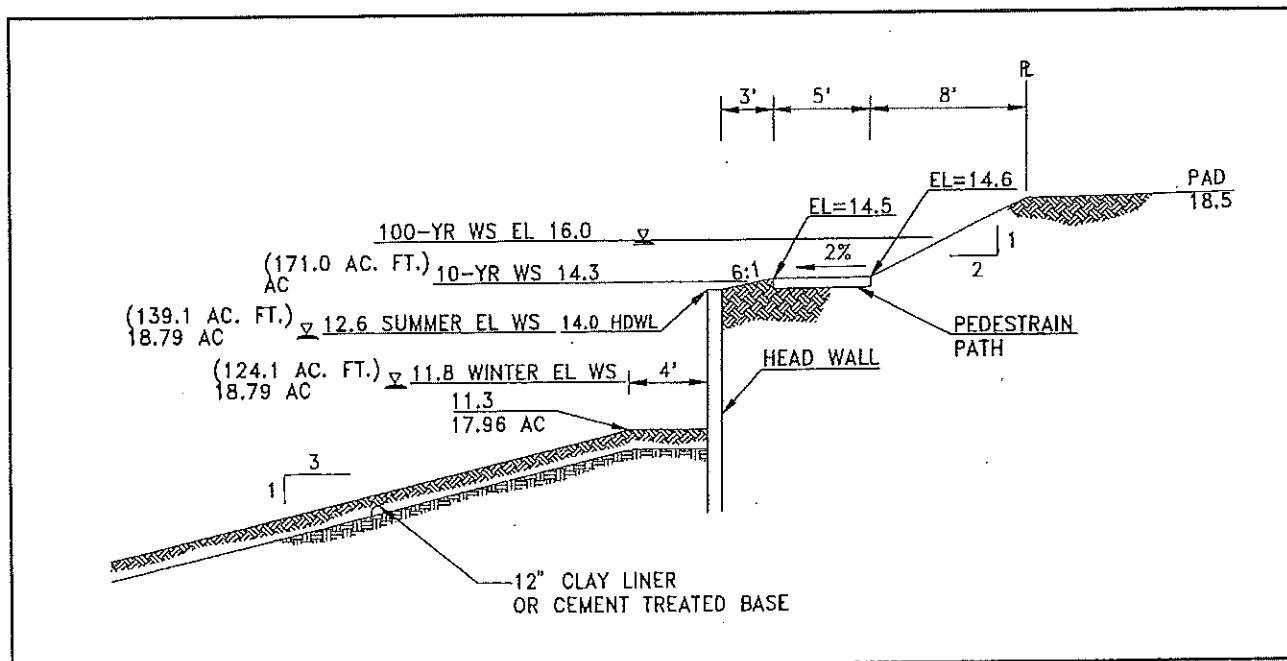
Detail of lake perimeter wall elevations (from Spinks Corp. drawing).
